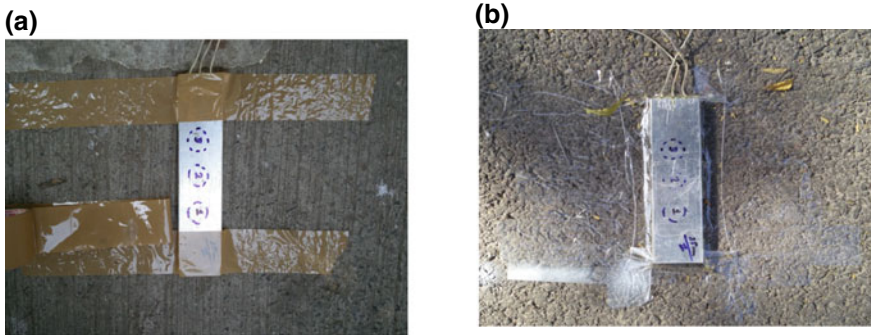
Photographs showing fixing of PEH-I on different surfaces. a Fixing of prototype on concrete pavement surface. b Fixing of prototype on bituminous pavement surface
